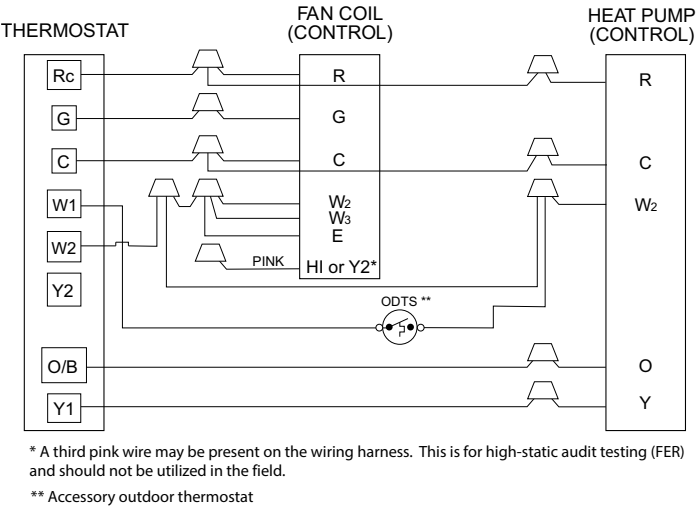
Wiring Layout - Heat Pump Unit (Cooling and Heat)
